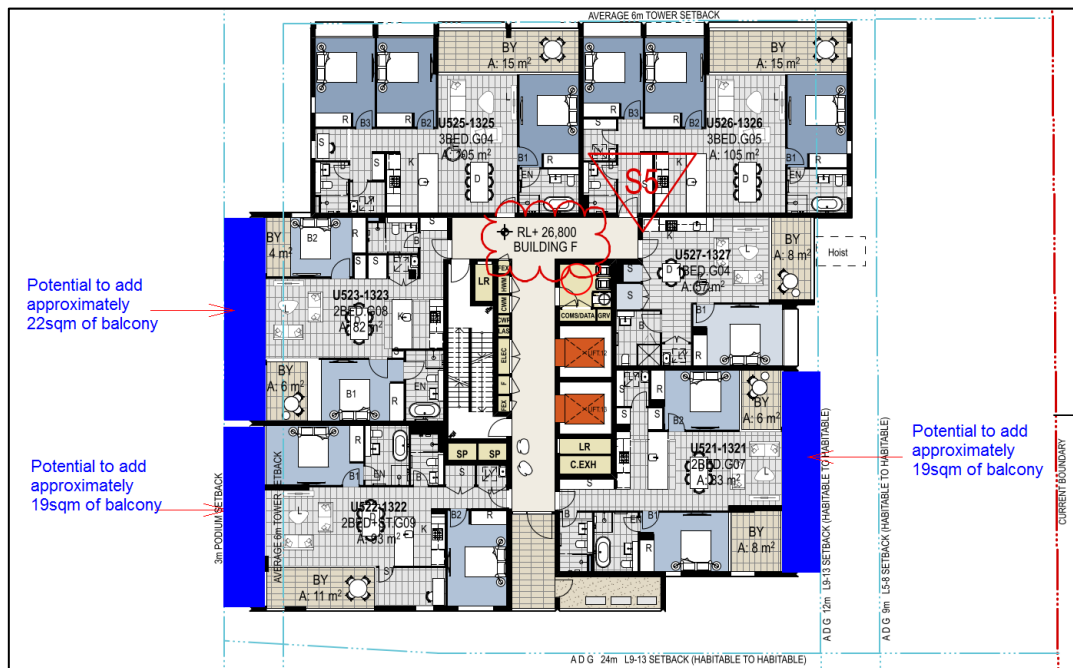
Council's proposed changes to the balconies of U523-1323, U522-1322 & U521-1321 (Level 5 – 13, Building F)
